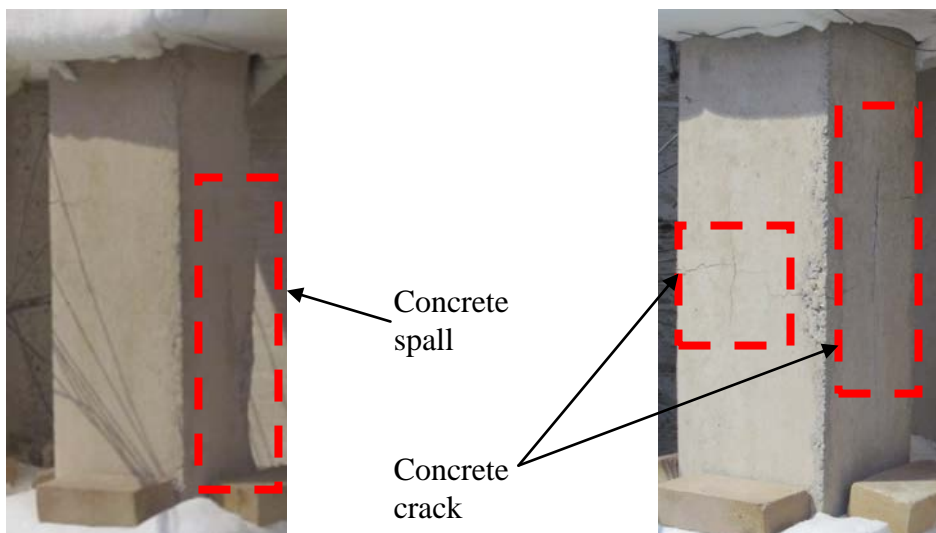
Crack and spalls of specimens after the fire test
